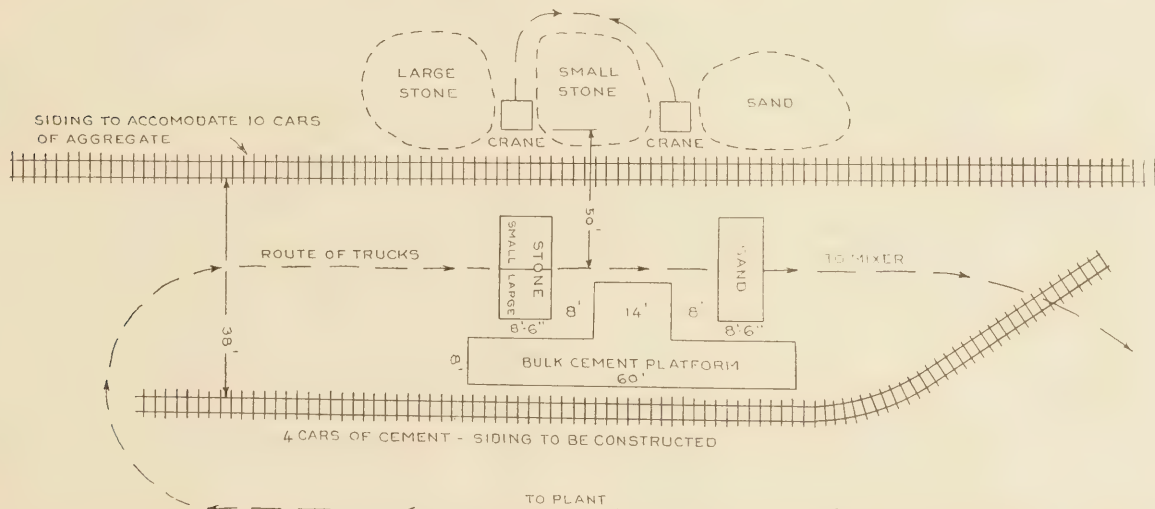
TYPICAL PLANT LAYOUT FOR STRAIGHT-LINE LOADING, ADAPTED TO BULK CEMENT. TRUCKS LOADED MECHANICALLY OR WITH CONCRETE BUGGIES; SAND USED FOR CEMENT COVERAGE
